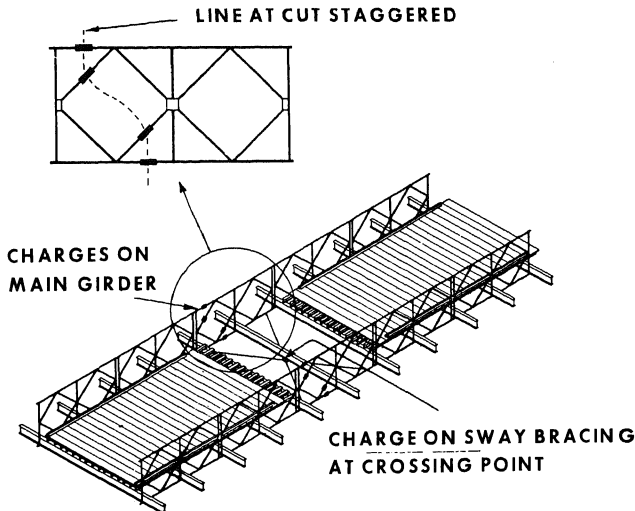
Destruction of assembled bridge. Placement of charges to collapse span.
